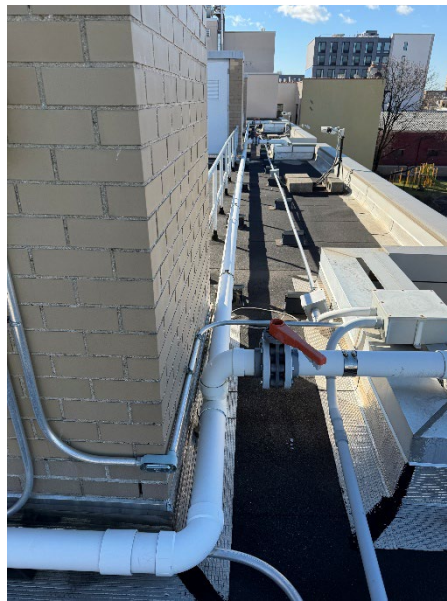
View showing Blower B SSDS piping run along the roof with legs heading down the side of the building.
